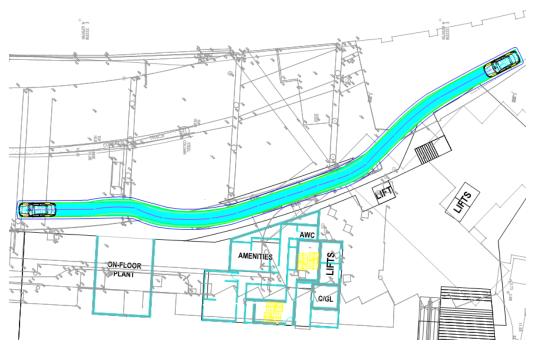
5.2m Car Swept Path at Indicative Plan of Drop-off facility
